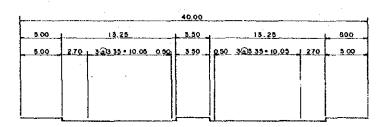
TYPICAL CROSS SECTION AT CORREDOR SUR (ATLAPA-RIO ABAJO)
